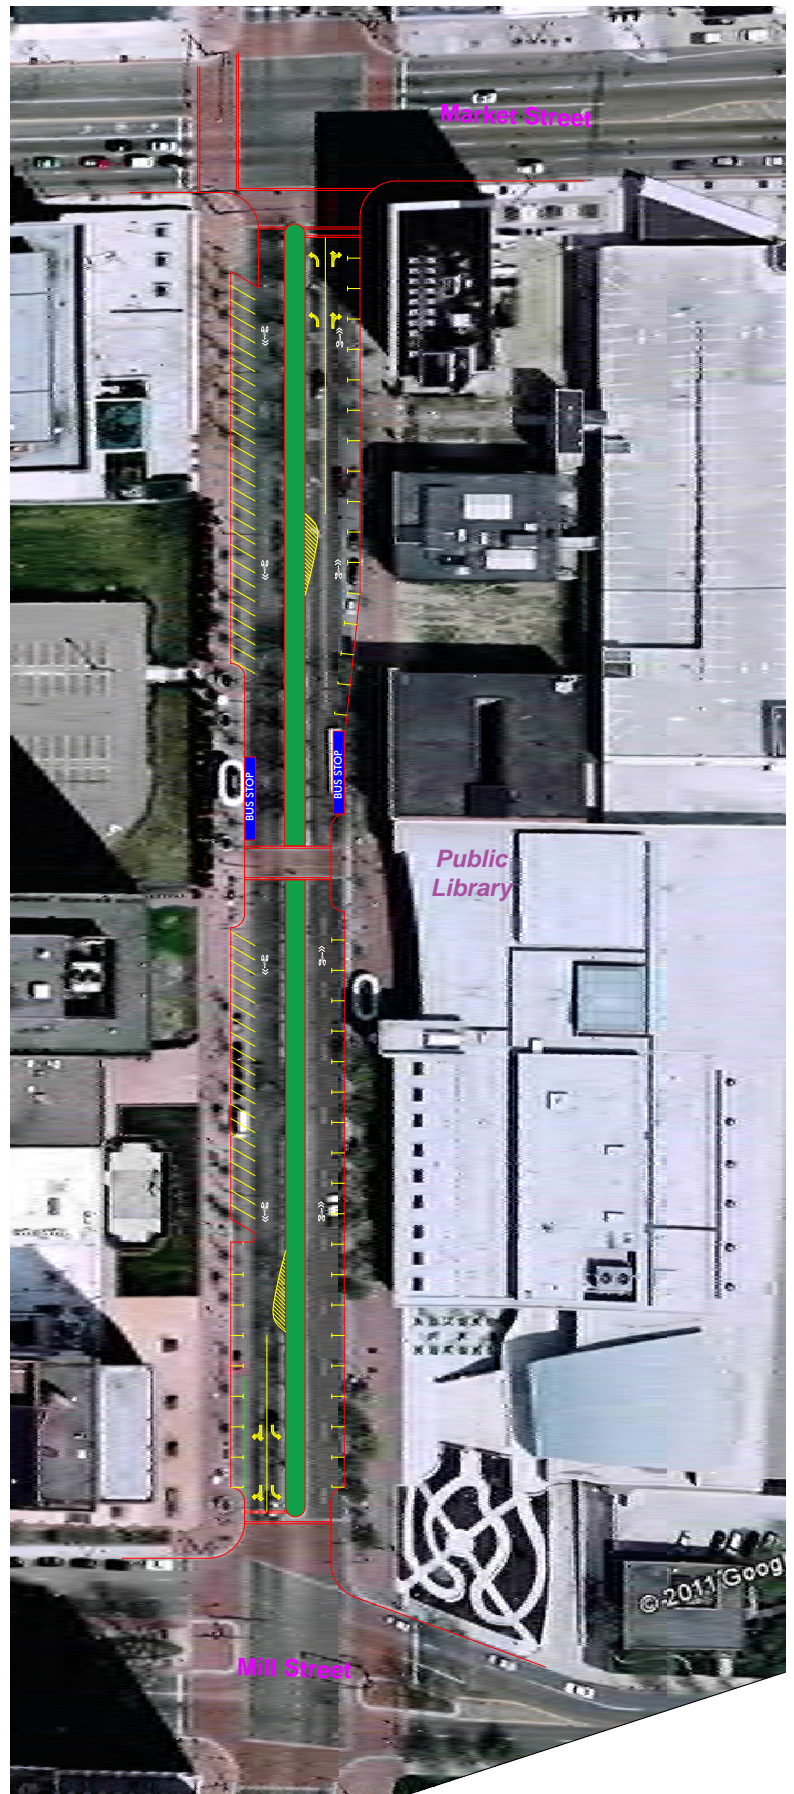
MAIN STREET - COMPLETE STREET CONFIGURATION
